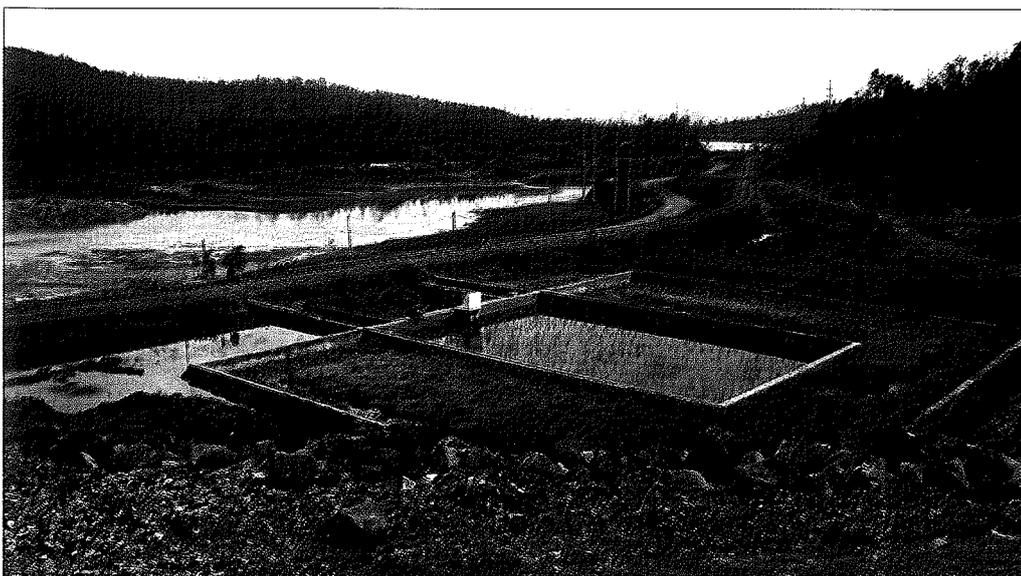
Constructed Wetland pilot plant at Dong Trieu mining site, north-eastern Vietnam, March 2011 (Picture by Jochen Müller, RAME)
